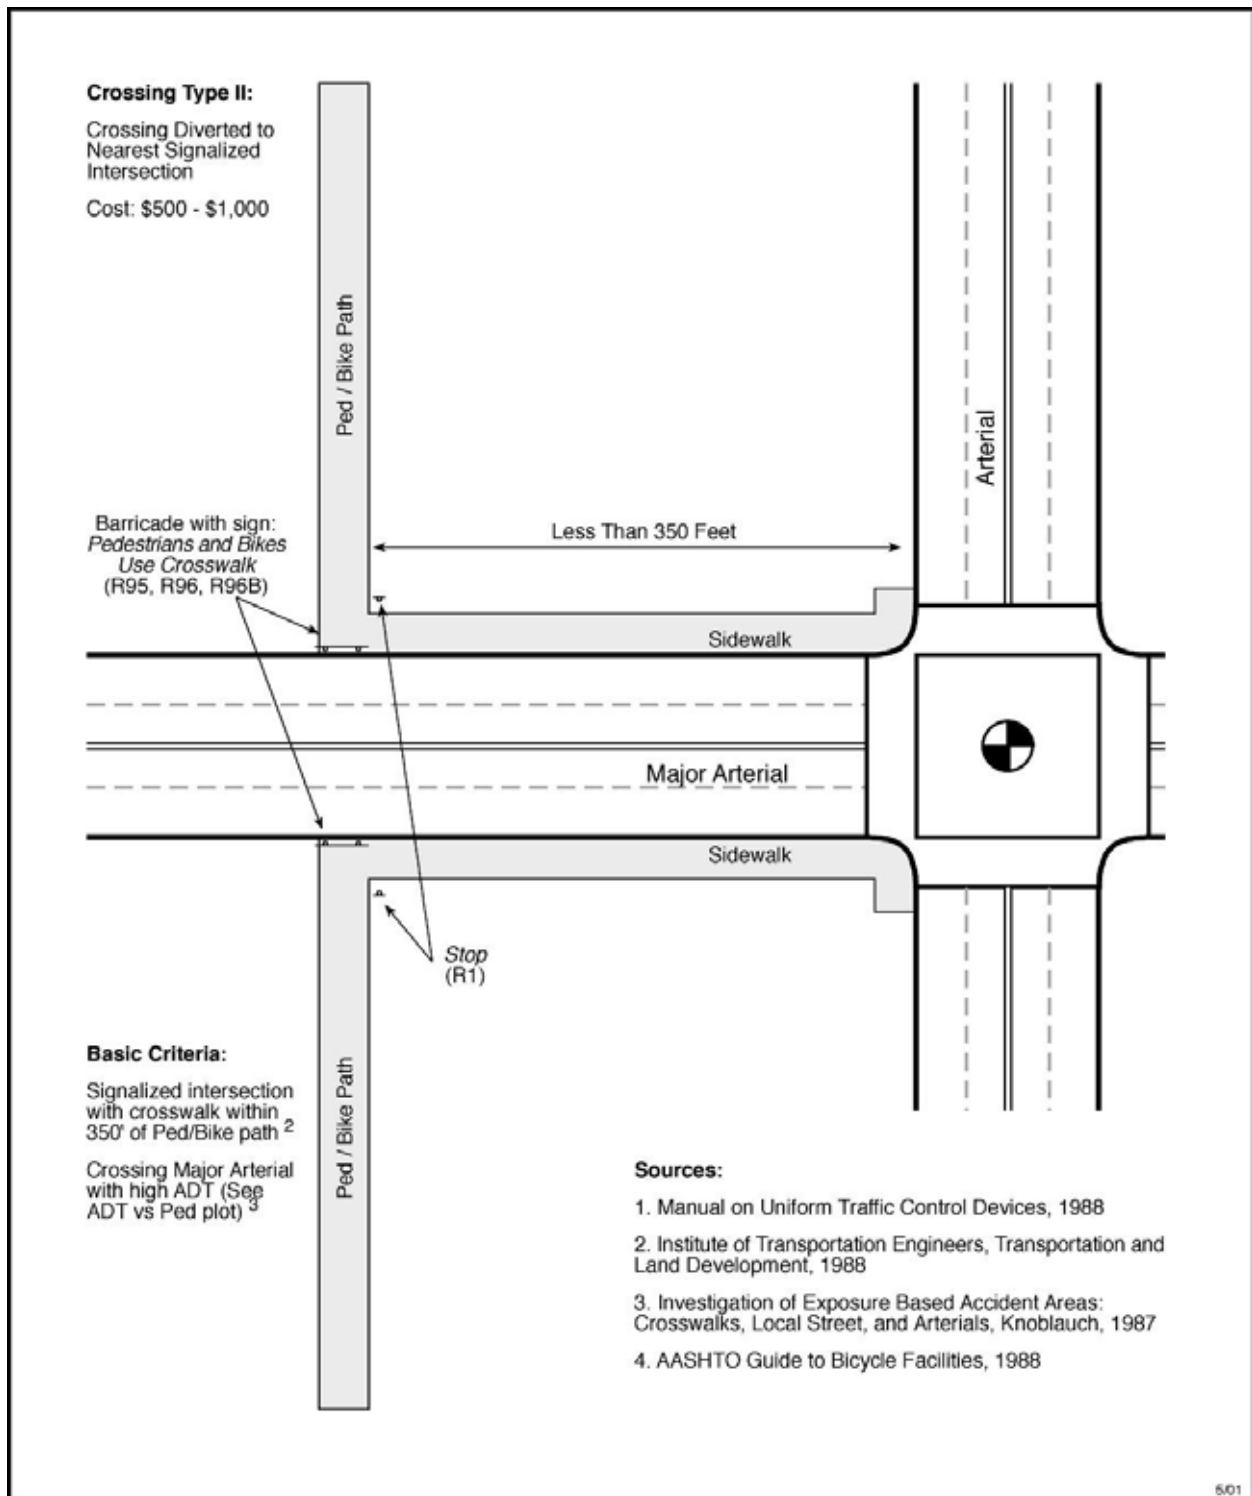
Type 2 Crossing Prototype, Divert Users to Existing Intersection
